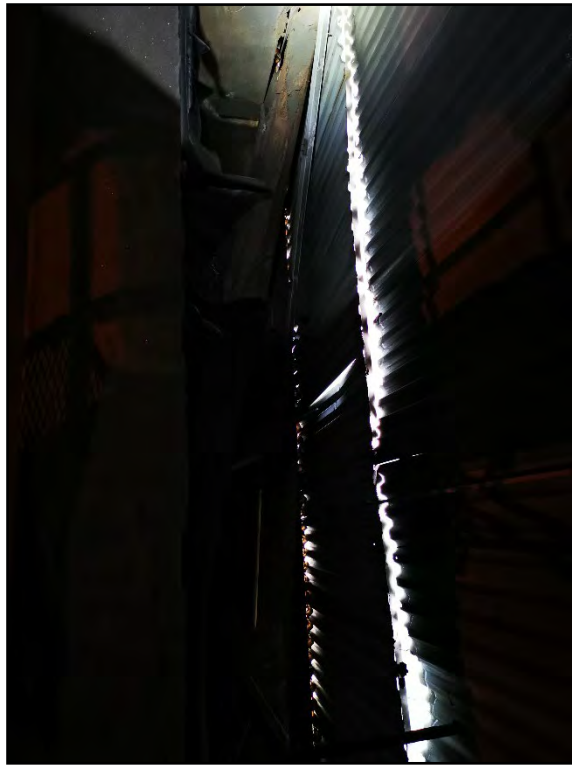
Corrosion of Fascia Purlin and Product Deposit on UB Section
